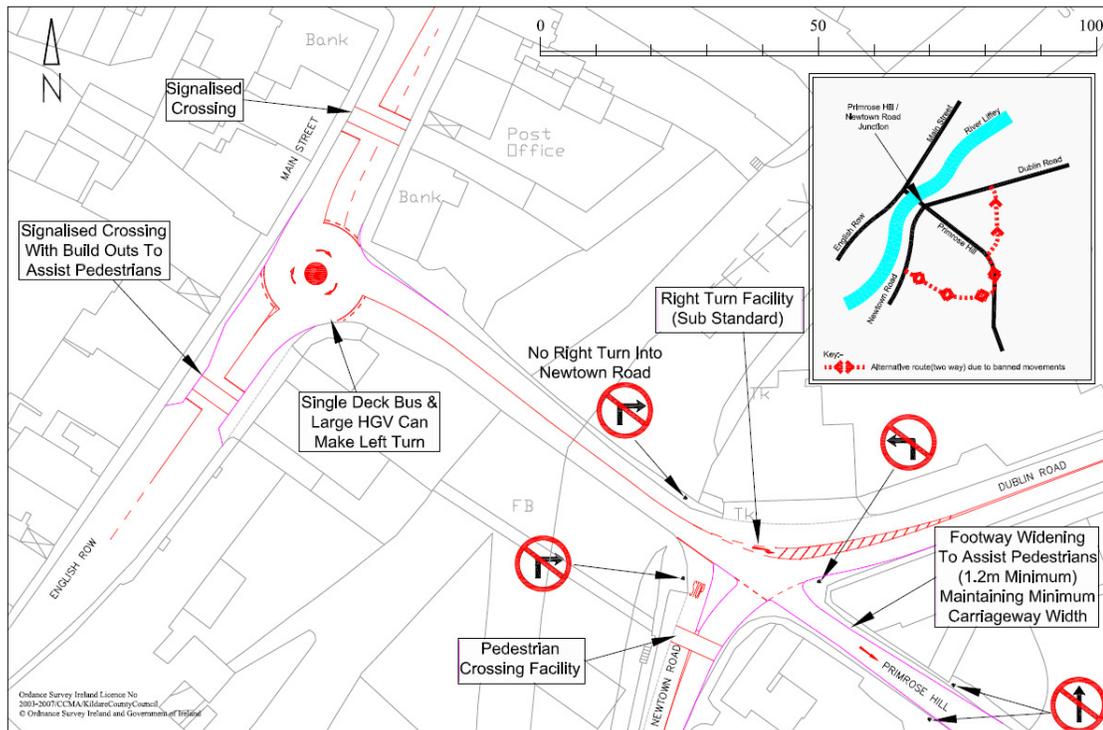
Proposed junction improvements, adjacent to River Liffey Bridge, Celbridge
